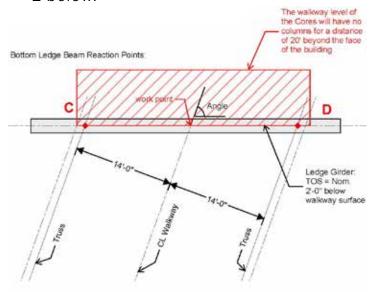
BOTTOM SUPPORT LEDGE PEDESTRIAN WALKWAY PLAN
